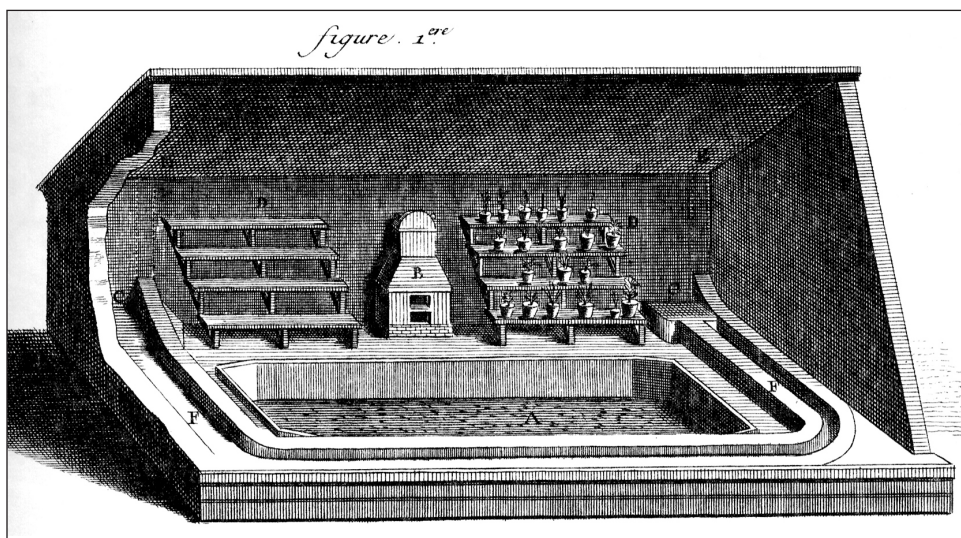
An illustration from Diderot's *Encyclopédie* showing a greenhouse with sub-floor flues circling the interior of the building. A furnace is visible between the shelves along the back wall.
